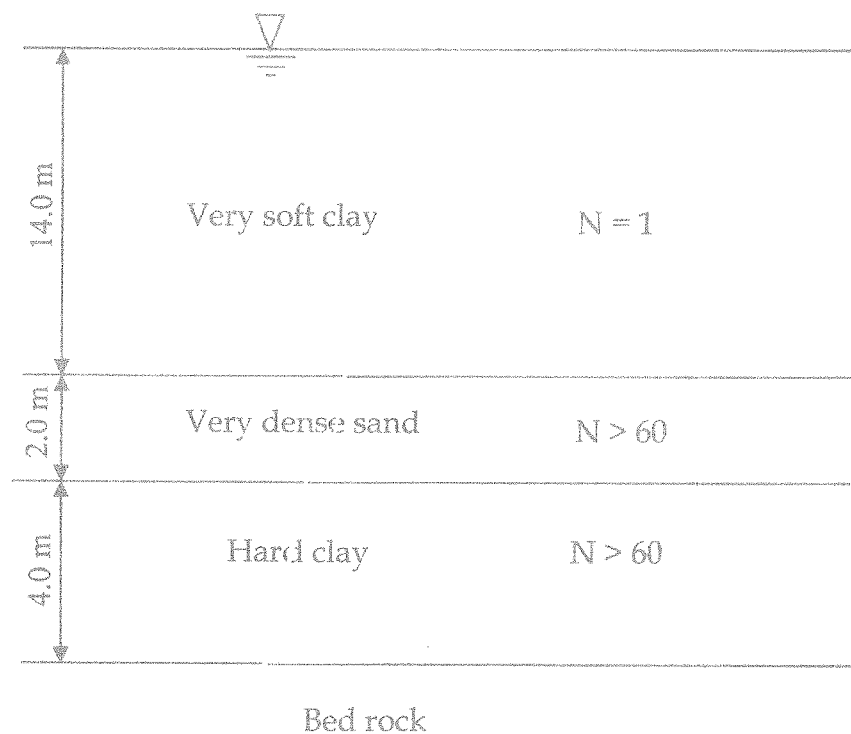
Subsurface soil profile at abutment A1 of river bridge at EK0+243~EK0+331
